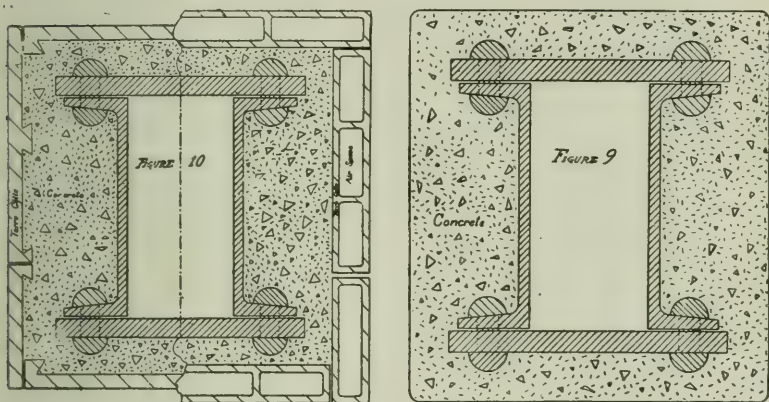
Fallacious Method of using Clay Tile and Concrete for Protective Covering. An All-Concrete Protection would be very much better.
